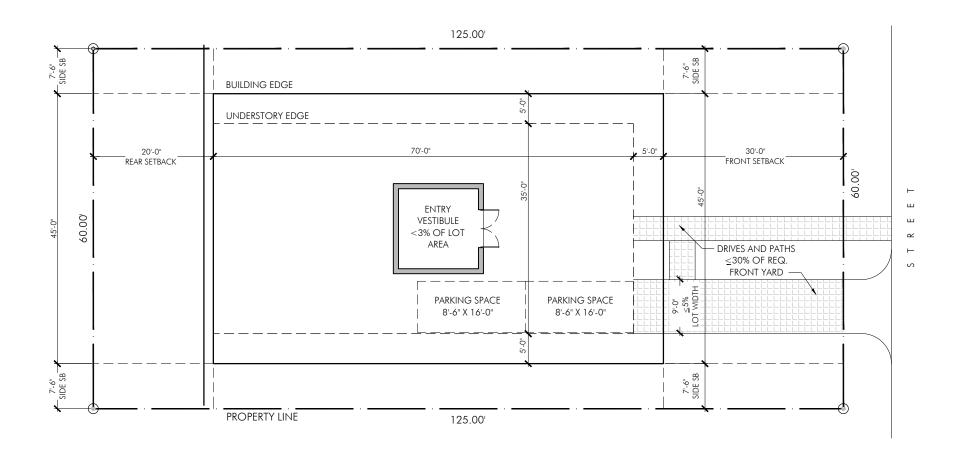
EXHIBIT A: PROPOSED CONDITION 60' LOT (SECTION)
